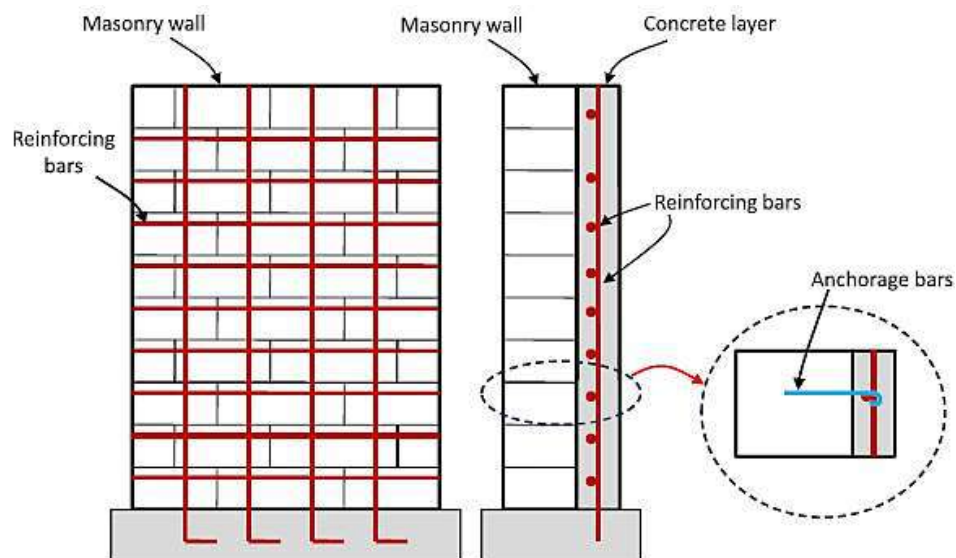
Typical detail of masonry wall strengthening with reinforced concrete layer (Ghiassi et al., 2012)
